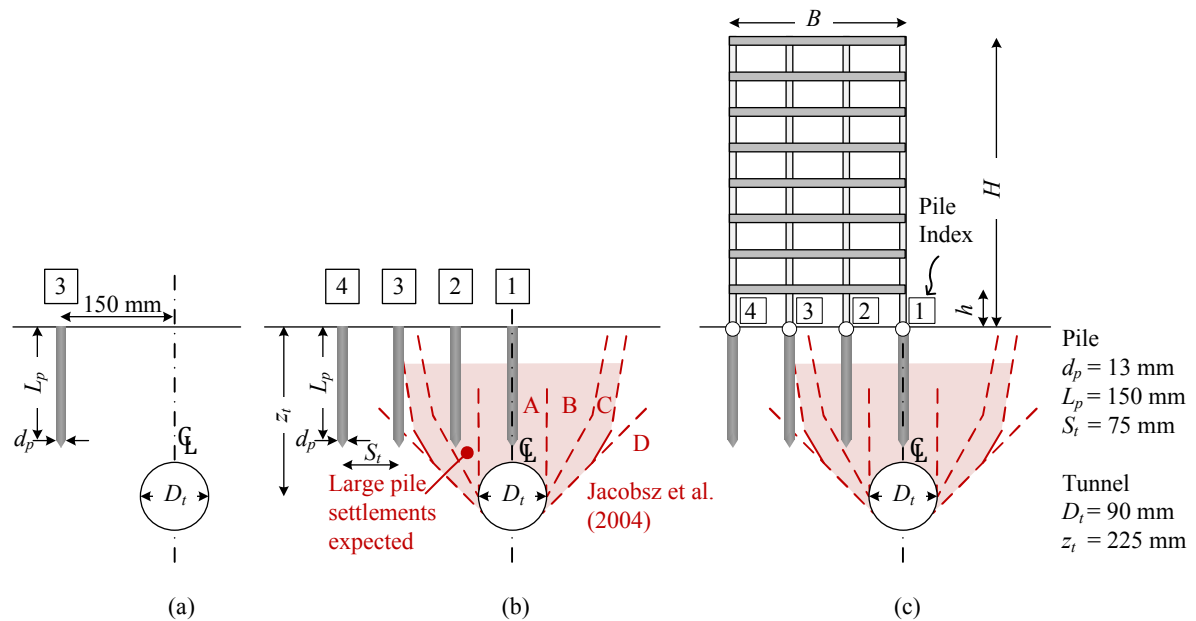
Test layout (in model scale): (a) loading tests, (b) tunnelling beneath a single pile, and (c) tunnelling beneath a piled frame (the geotechnical domain is modelled in the centrifuge, whereas the frame is modelled numerically).
